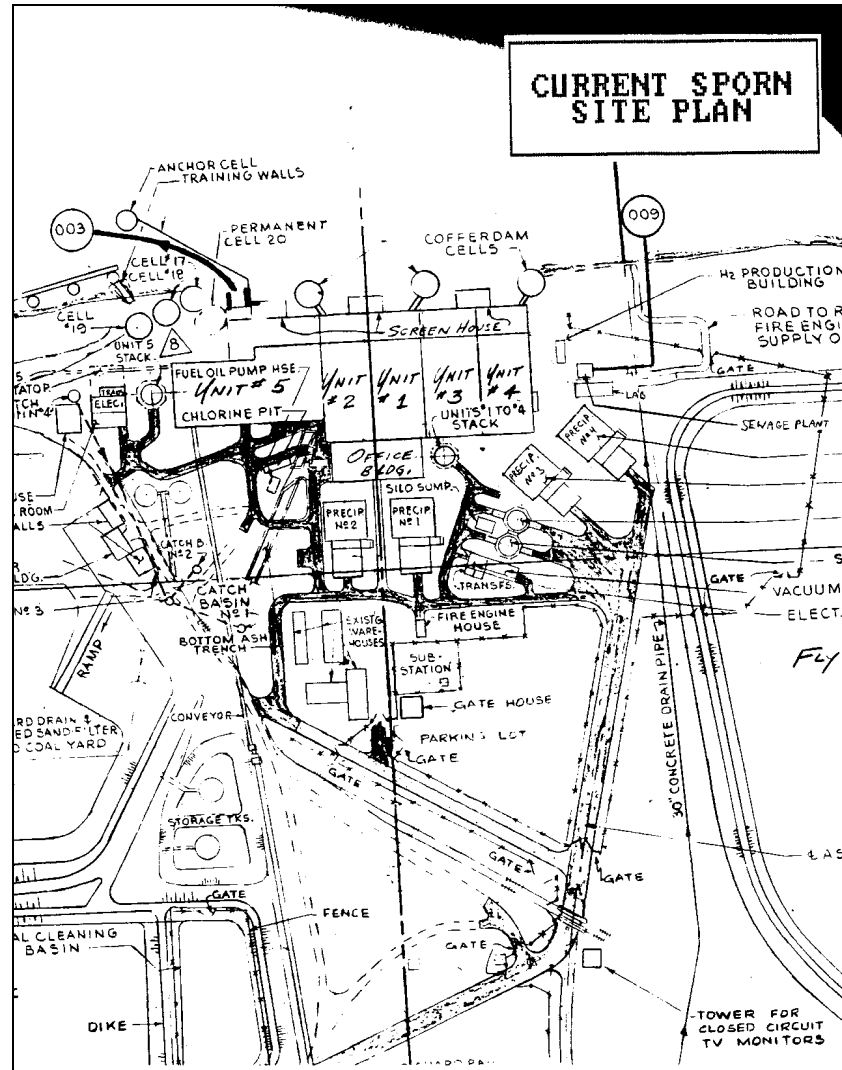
Philip Sporn Plant - Plan View of Existing Site
